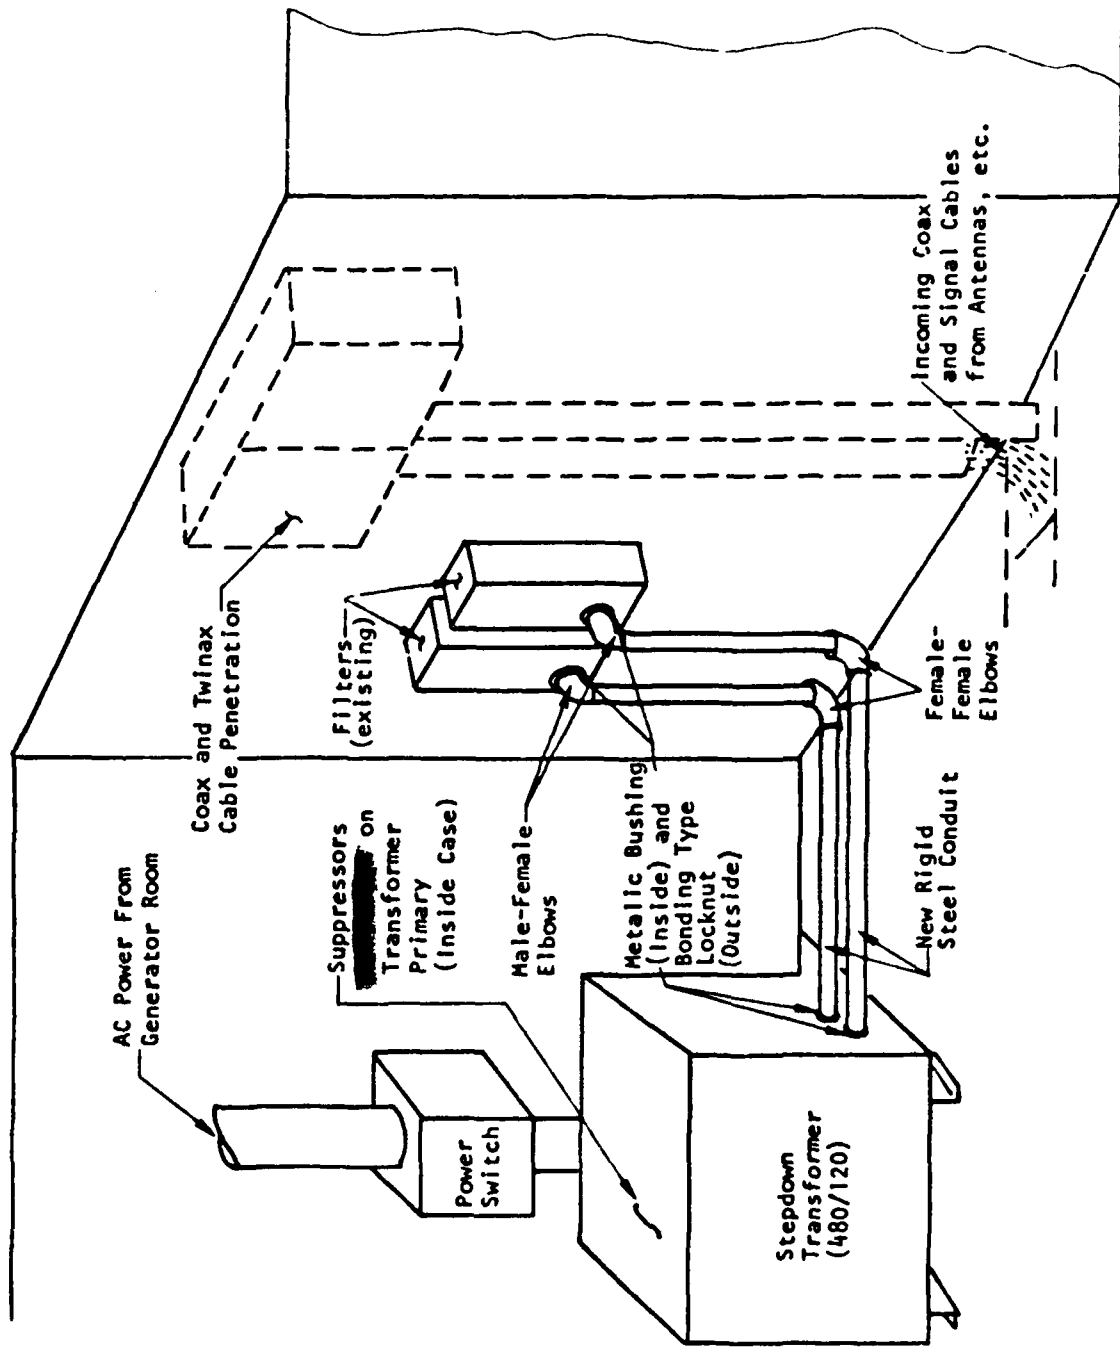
AC power hardening installation; timer room outside wall.
